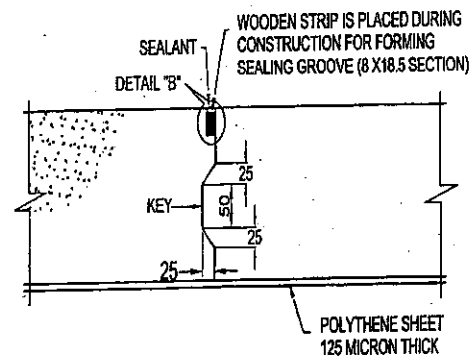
Joints in Cement Concrete Pavement (contd.)
